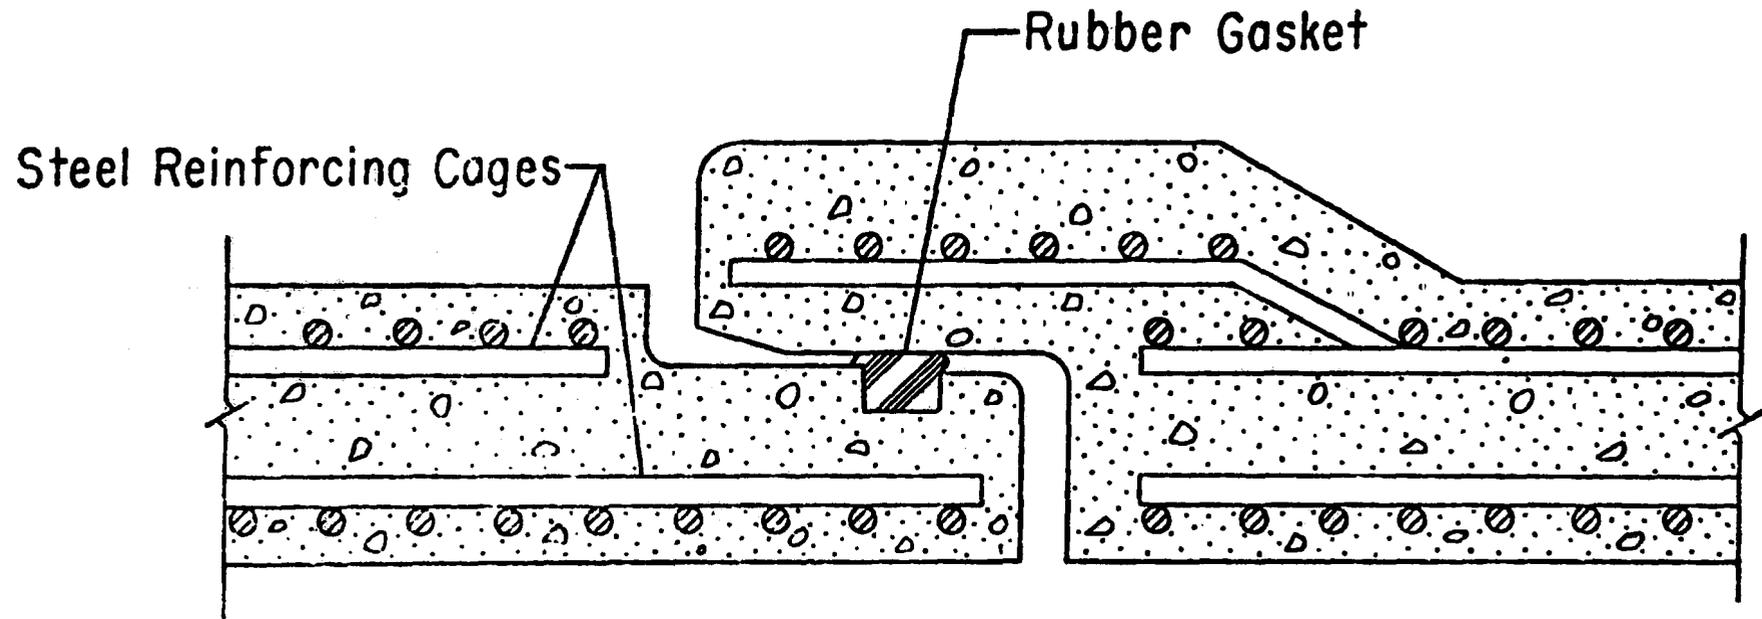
Reinforced concrete pressure pipe (bar pipe).
